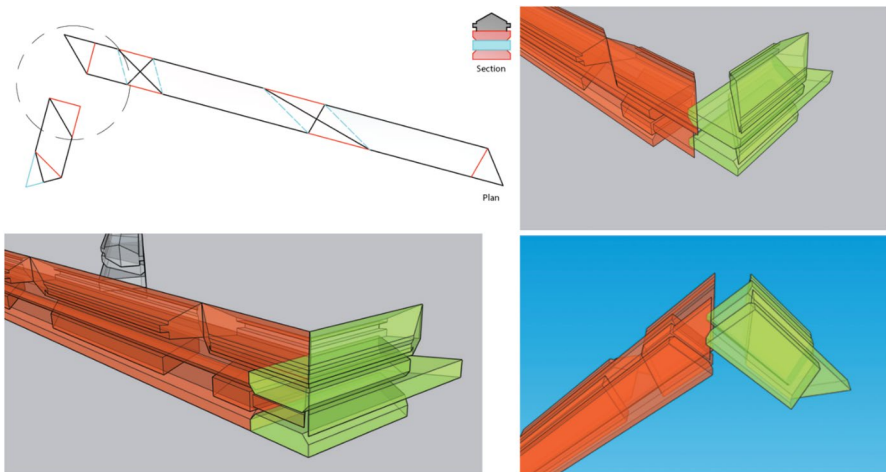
Lath cross-section, dimensions, joint details, and 3D view of mortise–tenon connection
